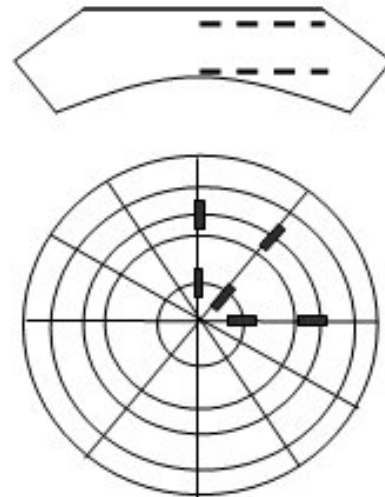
Plan and elevation view of outer plug with rebar gage locations (not to scale)
